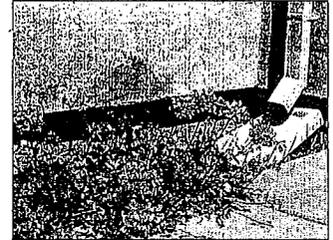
Disconnected downspouts drain to planted bio-filtration strips.
